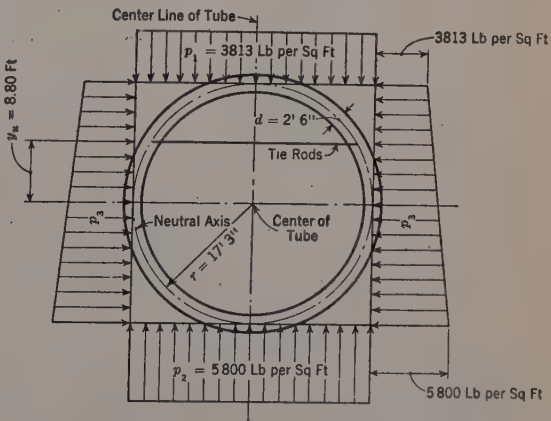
TUBE SECTION AND LOADING USED IN EXAMPLE.
